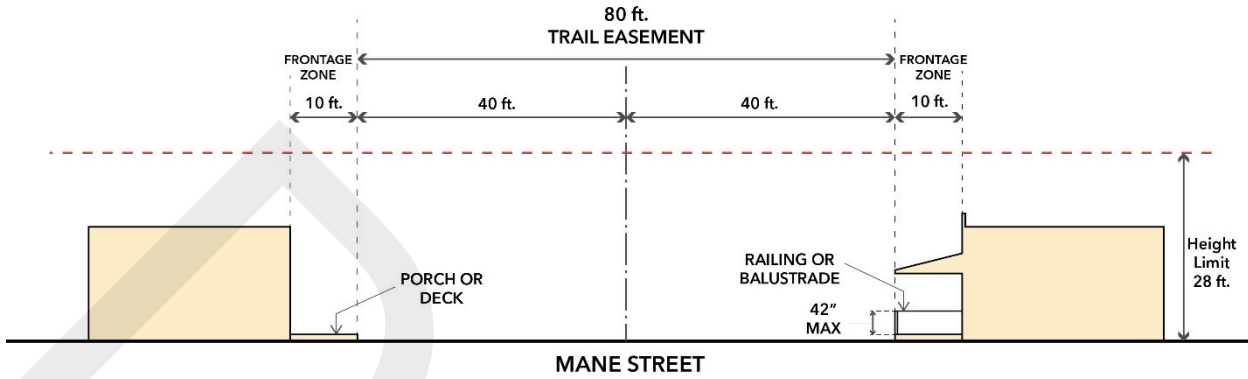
SD-MSHD Street Cross Section – Other Streets
